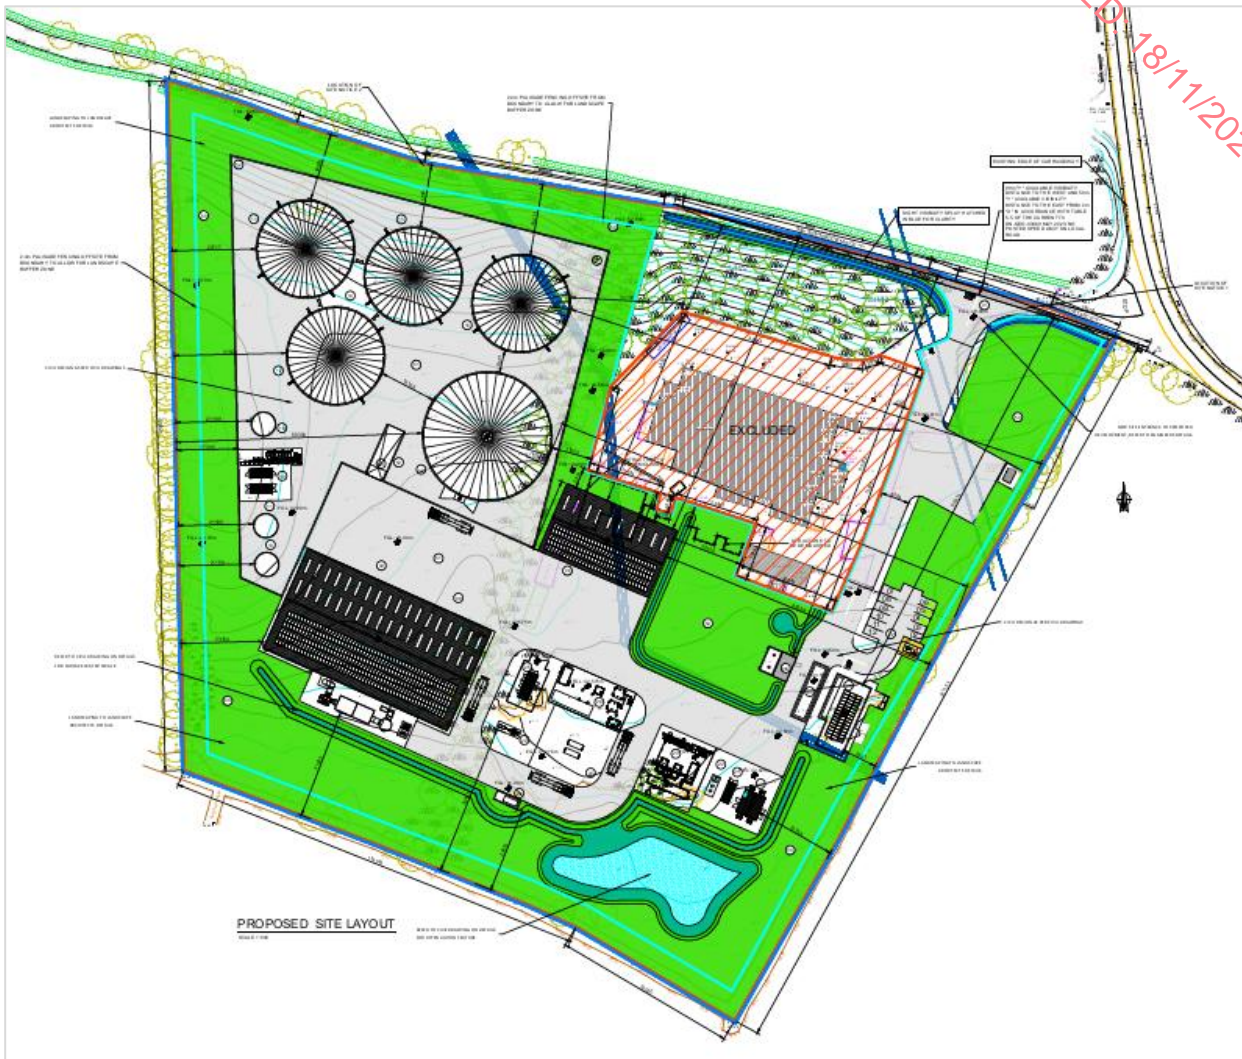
Site layout with proposed and existing site levels (Drawing No: 231960-ORS-ZZ-00-DR-AR-200)
